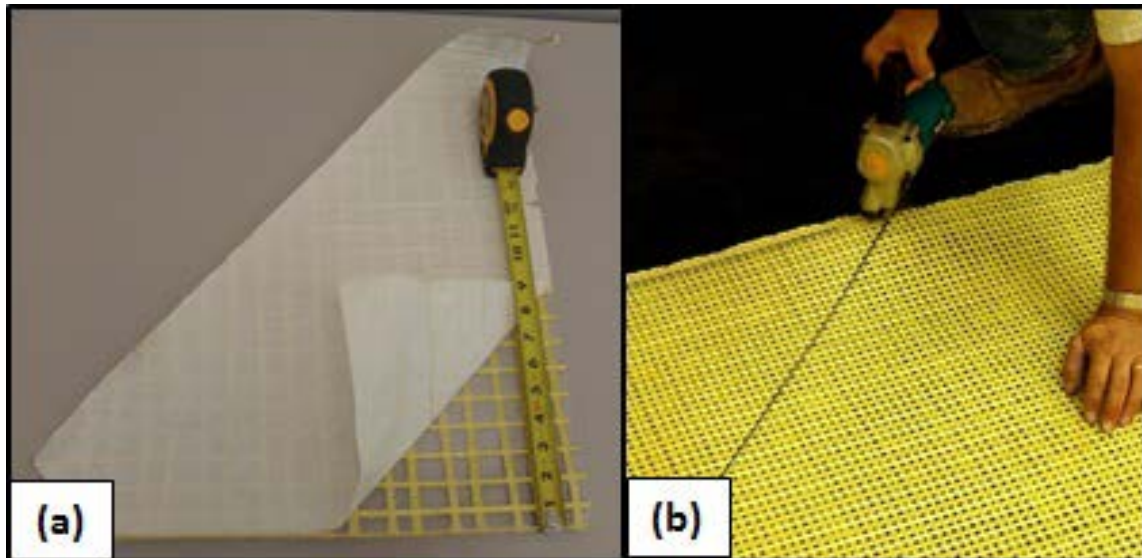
Fabric preparation. (a) A PSA was added to one face of the fiber reinforcement. (b) Fabric cut and labeled prior to application of first coat of spray-on polyurea.
